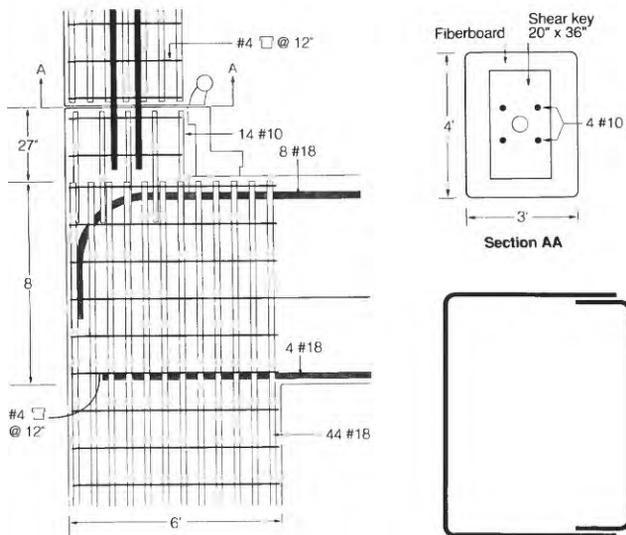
Pin reinforcement details for Cypress Viaduct.
